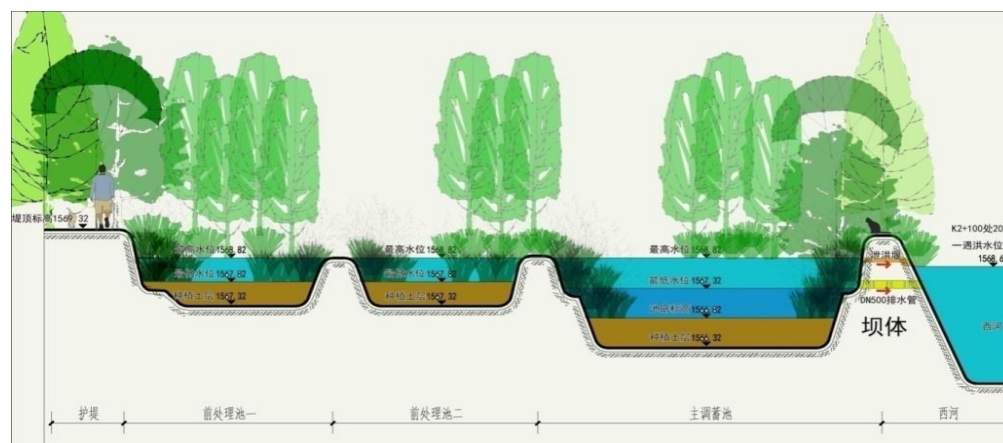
Cross Section of Stormwater Detention and Front Bays in Lufeng
